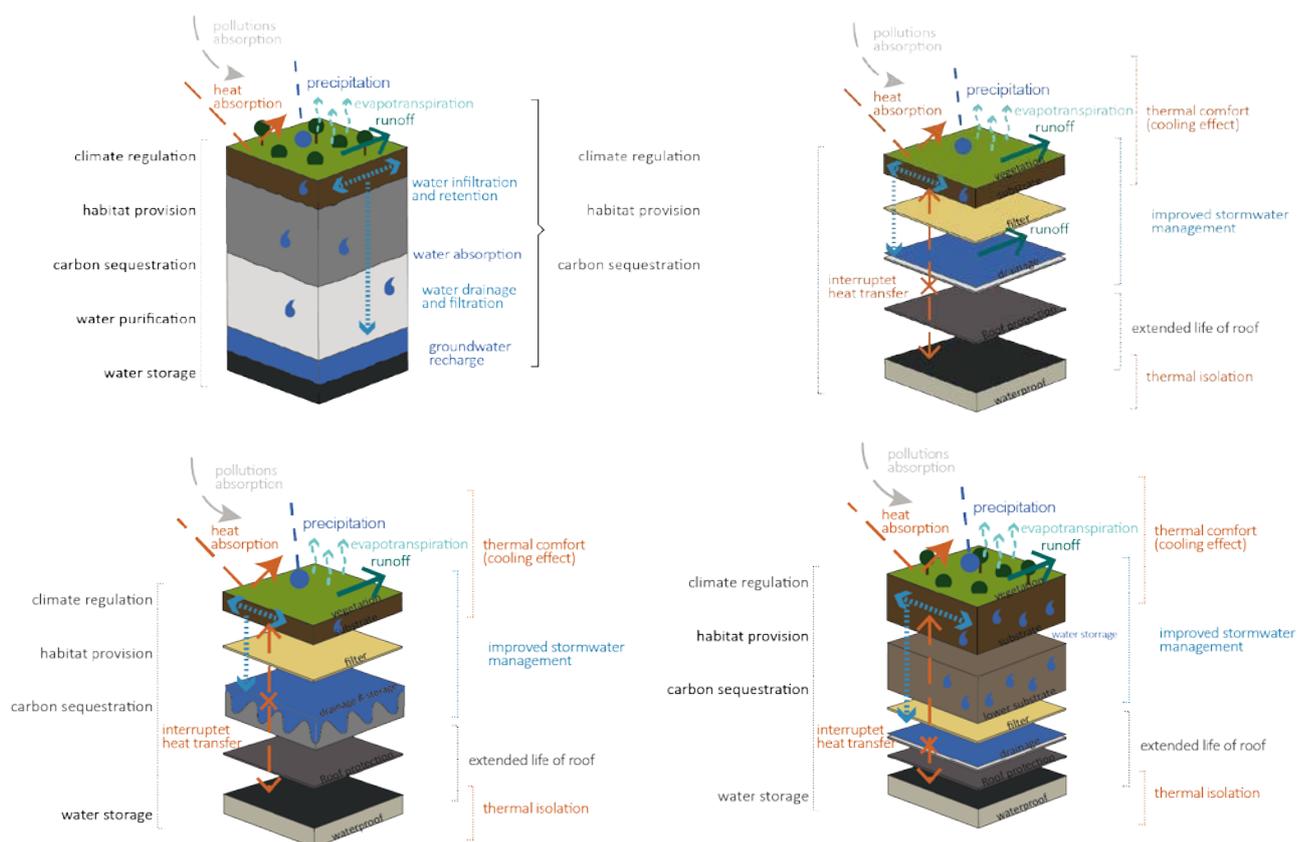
Upper row, comparison of the structure of natural soils (left) and extensive green roofs (right), lower row, smart roof with extra water storing capacity (left) and intensive green roof (right) (source: ILPOE, 2018)
